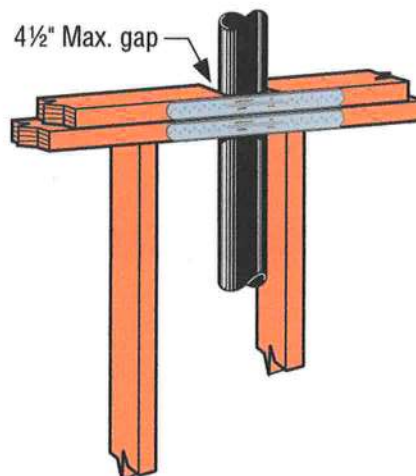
TYPICAL INSTALLATION OF CTS218 COMPRESSION/TENSION STRAP
